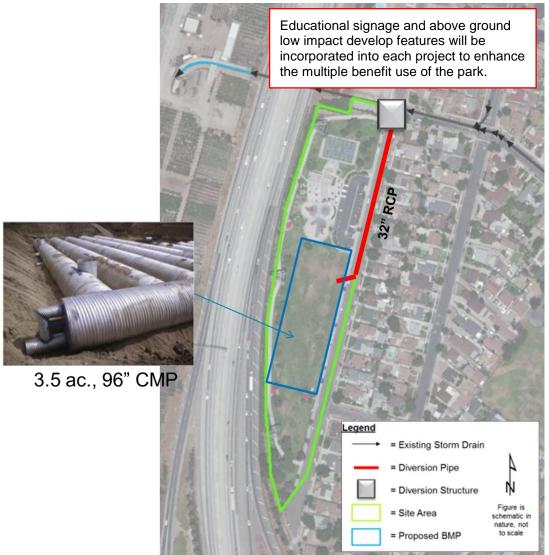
San Angelo Park and Vacant Lot – Preliminary Layout
